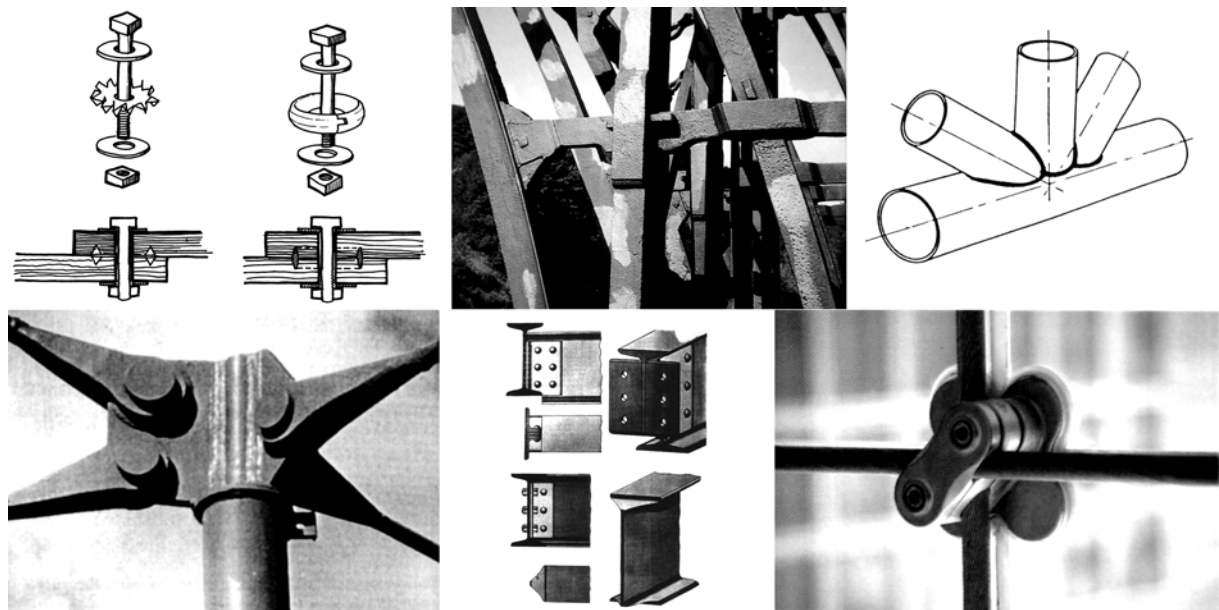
Structural Details, clockwise from top-left: clamping plate and split-ring timber connections (Sealy); pinned and wedged connections of cast-iron Ironbridge, 1779 (Brown); Welded node of tubular steel truss (Blanc and McEvoy); Cable-net node (Holgate); Typical steel beam connections (Yeomans); Tension rod – mast connection (Blanc and McEvoy).
